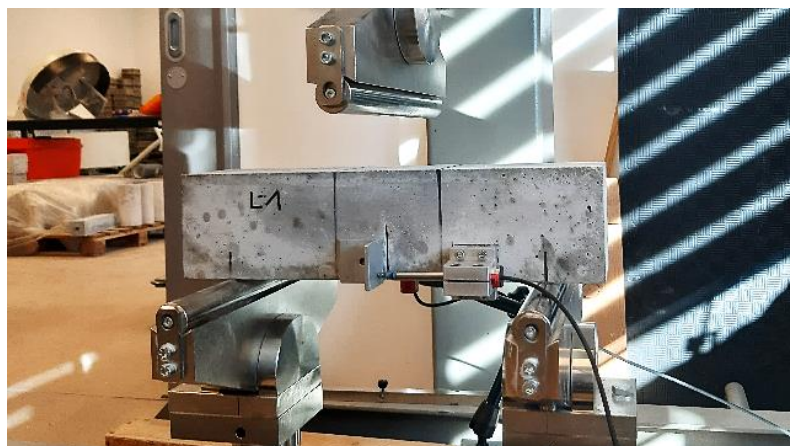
Three-point bending test configuration with a crack mouth opening displacement gauge installed
